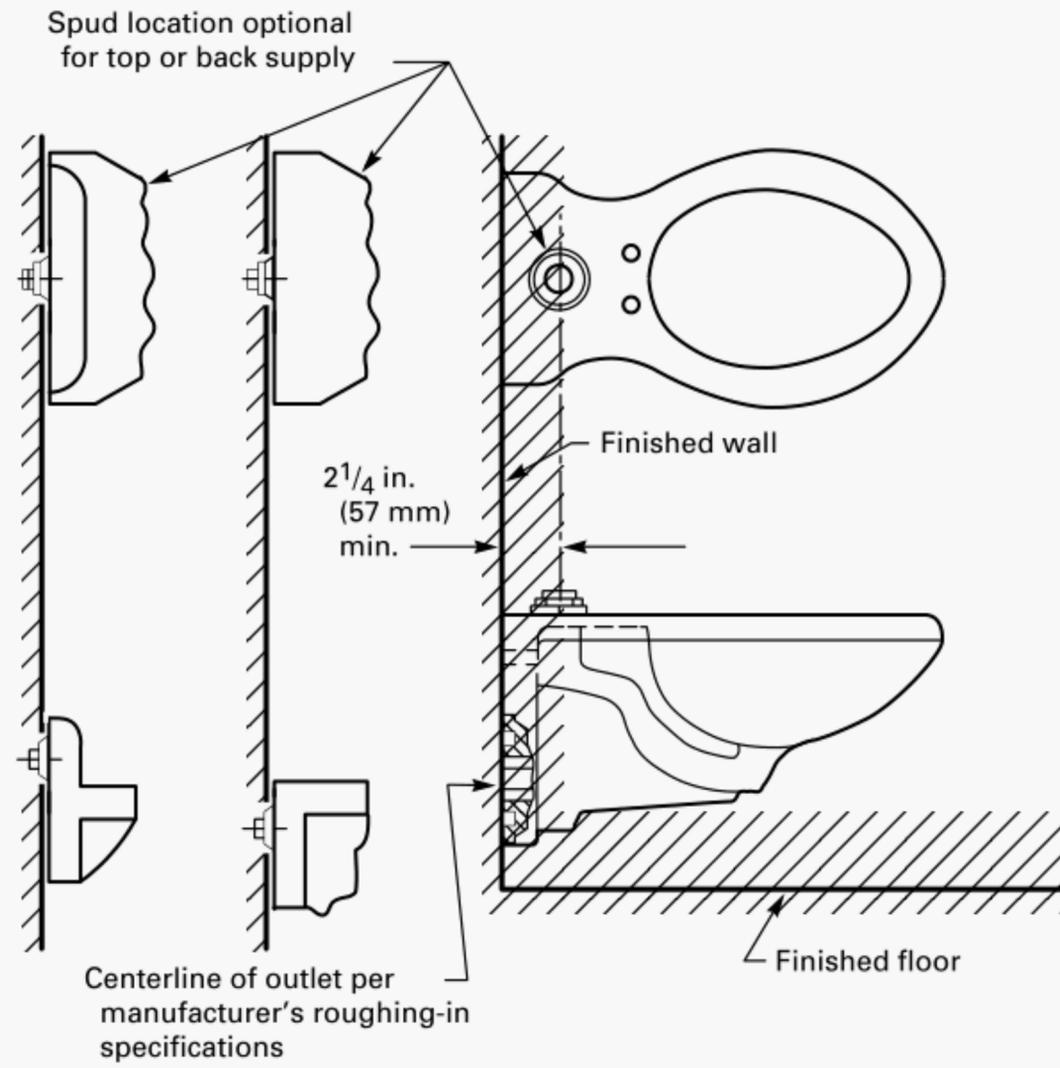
Wall-Mounted Water Closet Bowl for Flushometer Valve
